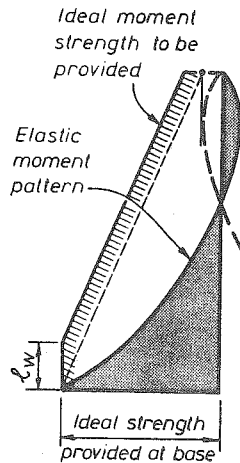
Design Moment Envelope for Walls of Hybrid Structures.
